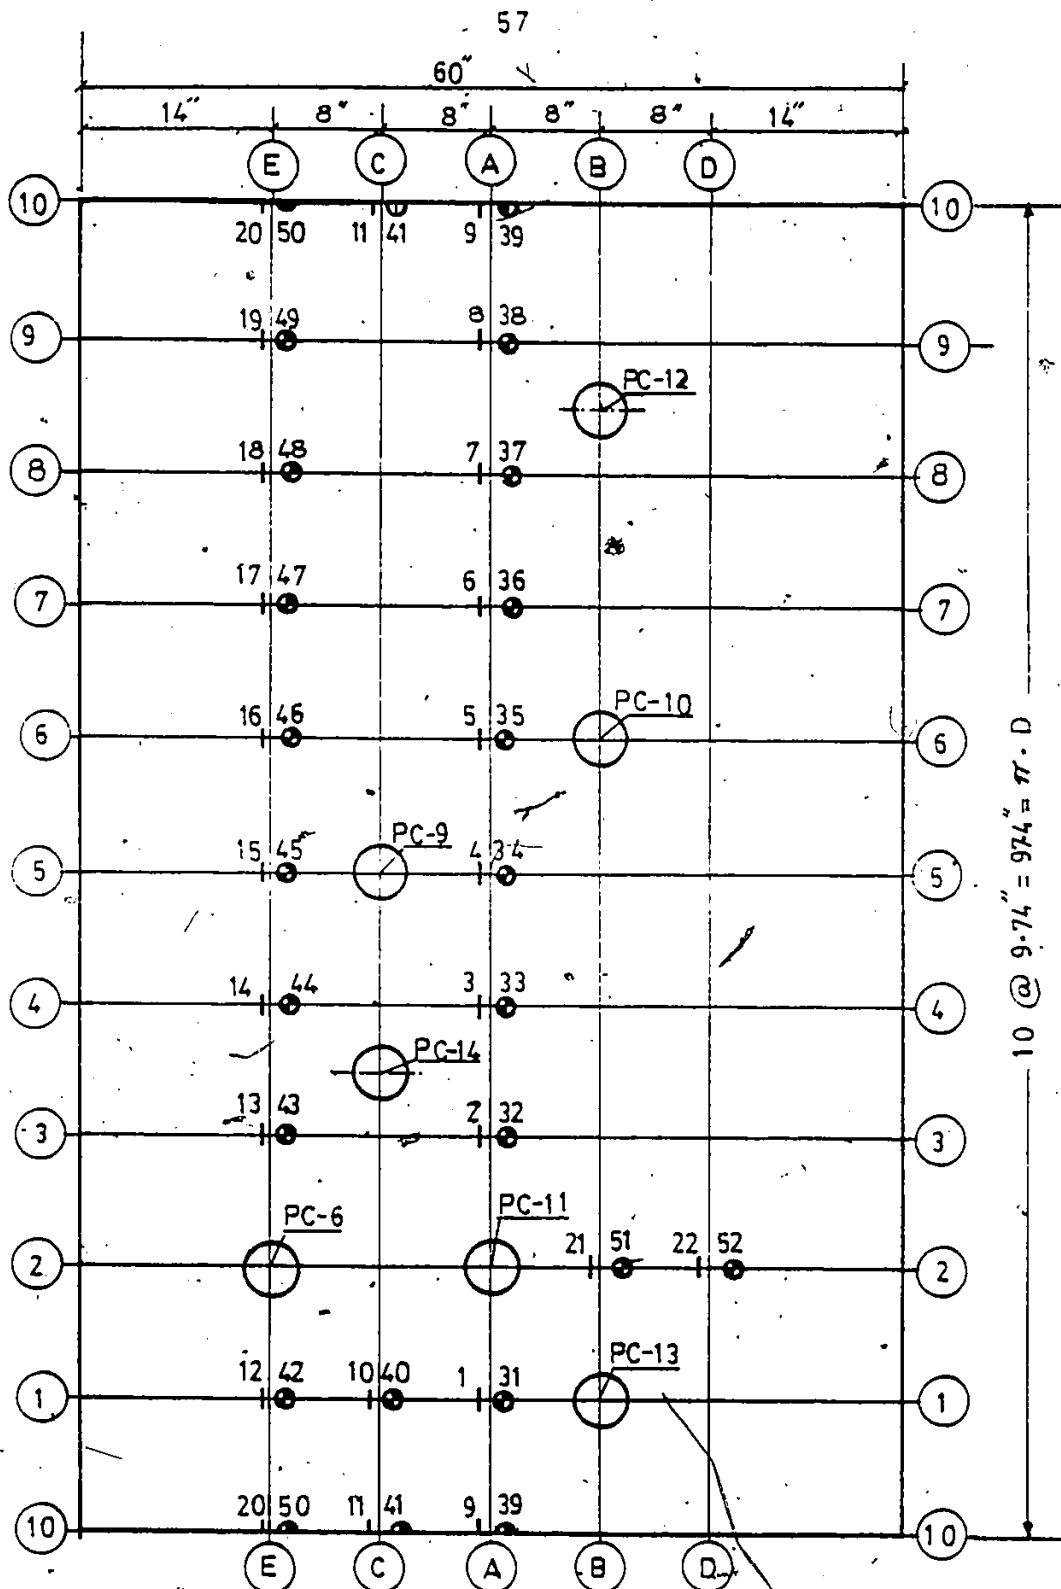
DEVELOPED PLAN OF CONDUIT #1 WITH INSTRUMENTATION DETAILS
